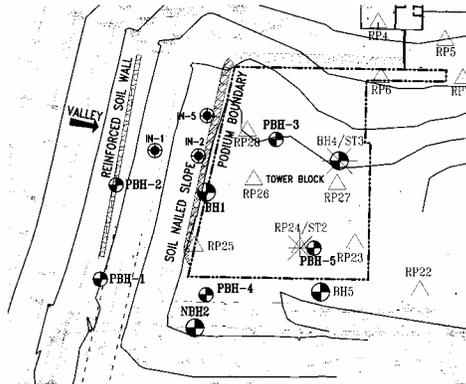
Site layout of soil nailed slope and reinforced soil wall
